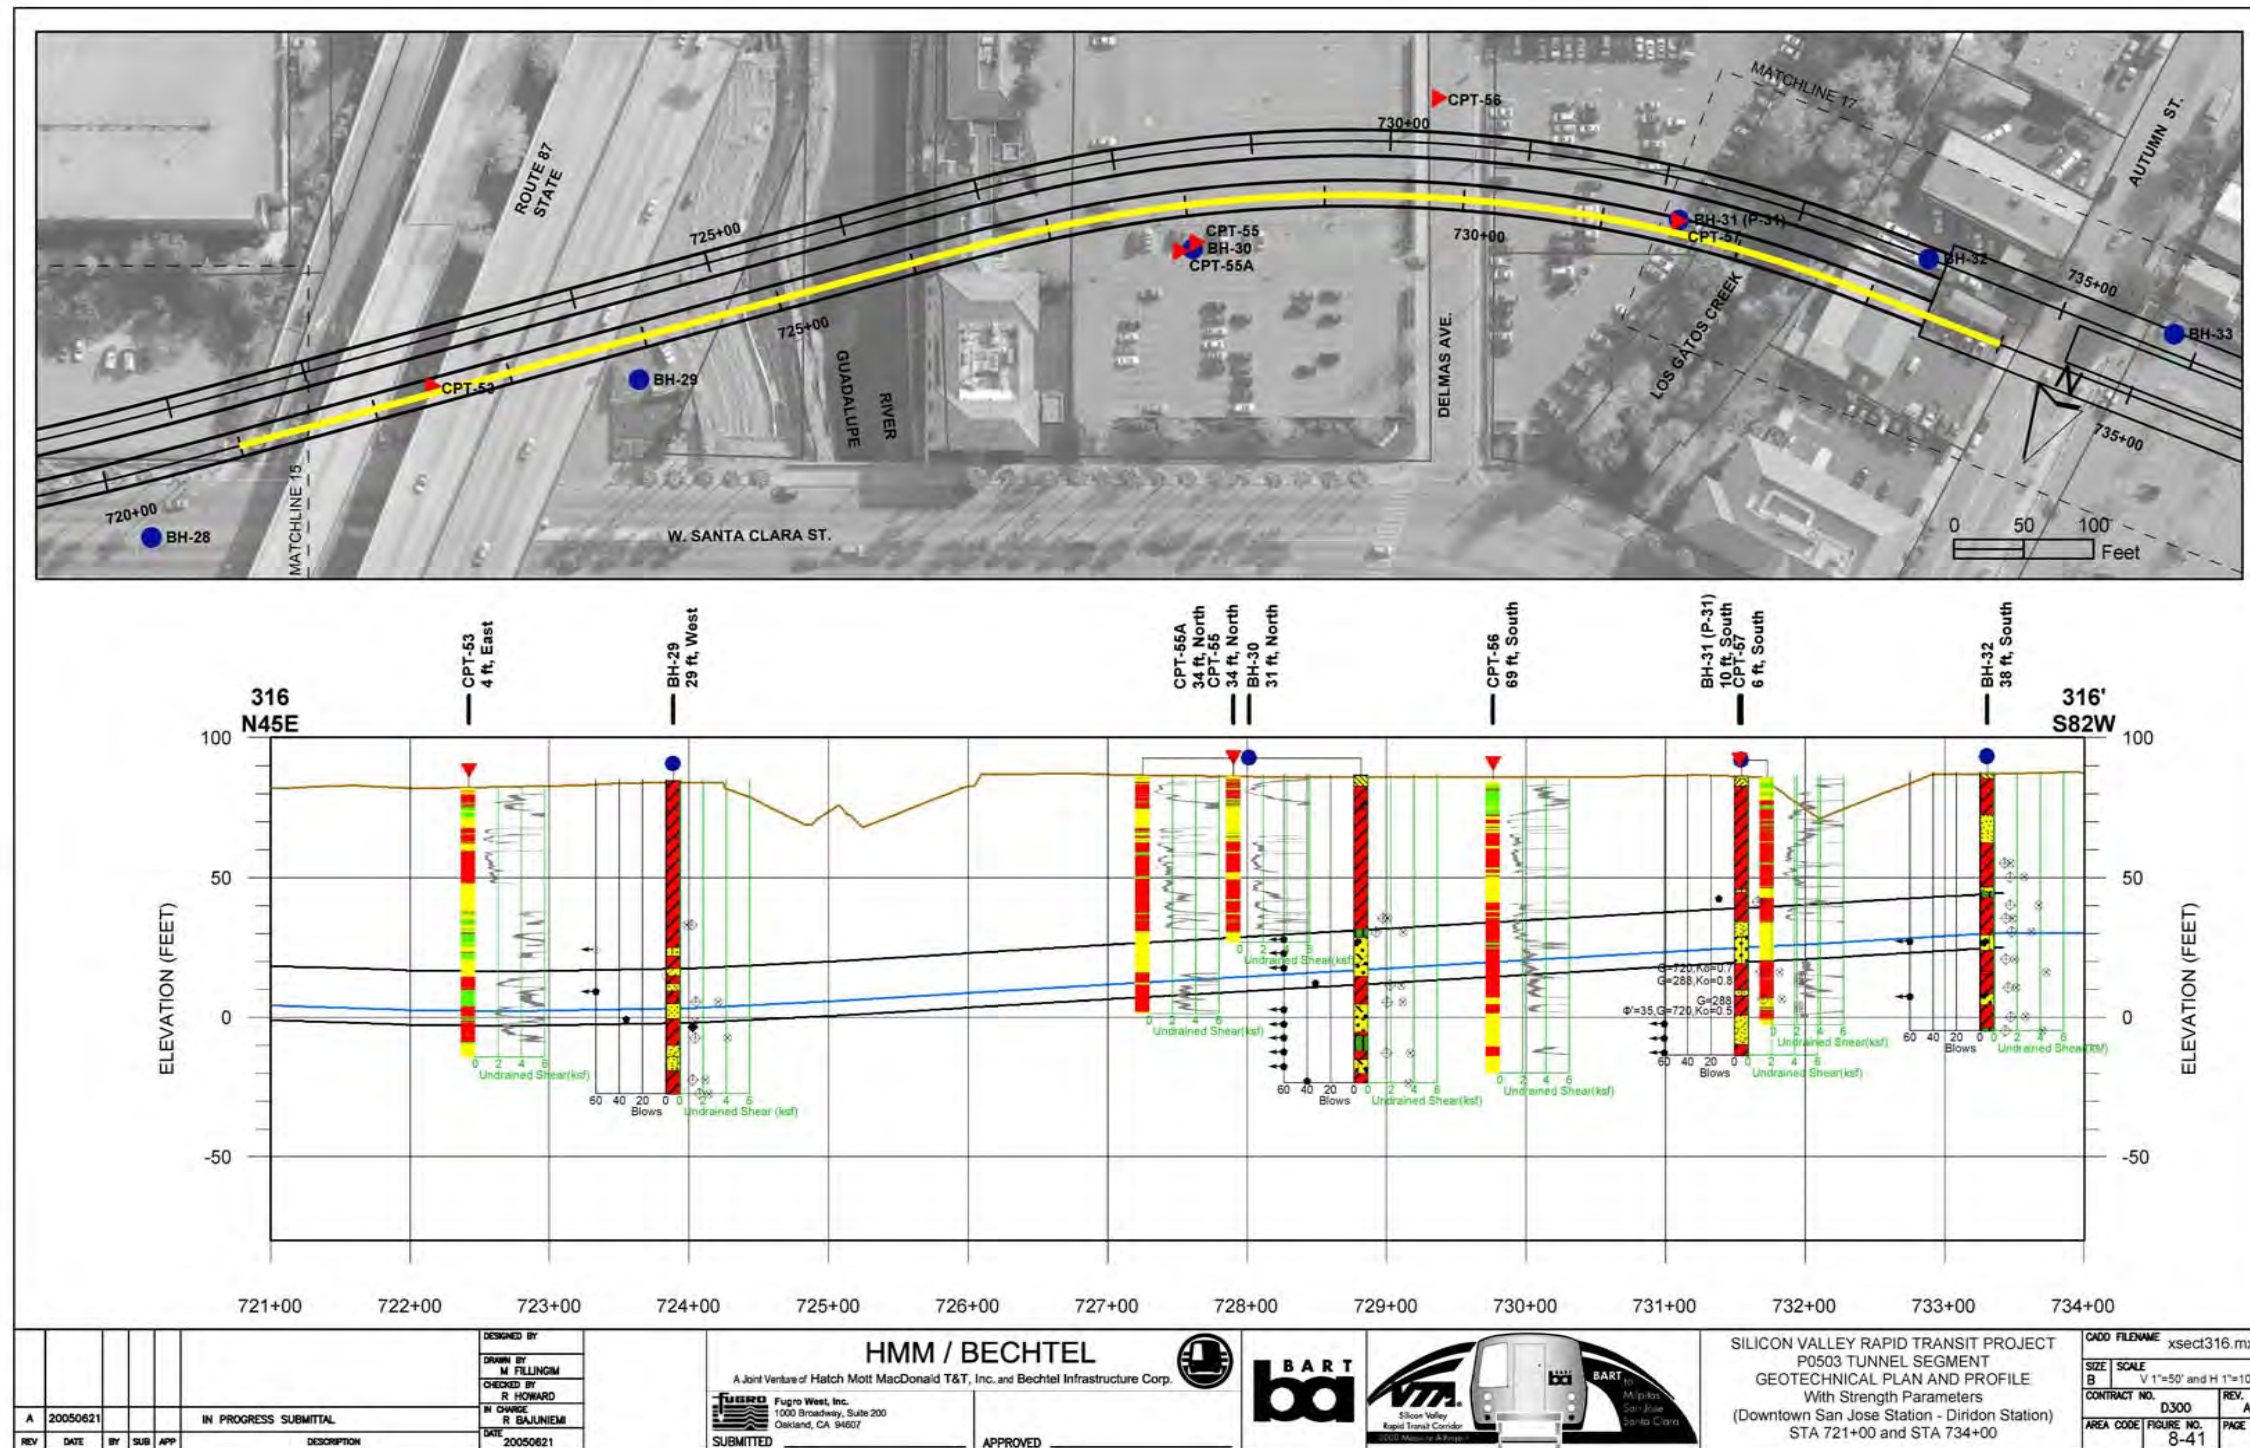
Geotechnical Plan and Profile with Strength Parameters: 721+00 to 734+00.
